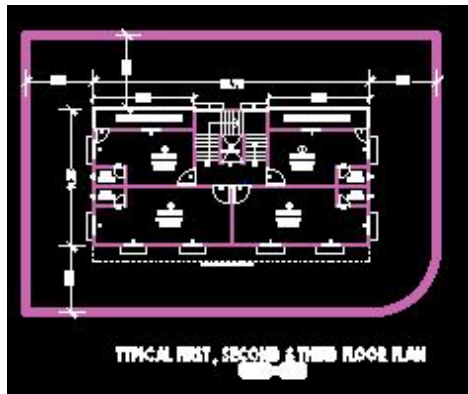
Typical 1st , 2nd & 3rd Floor plan in AutoCAD.
